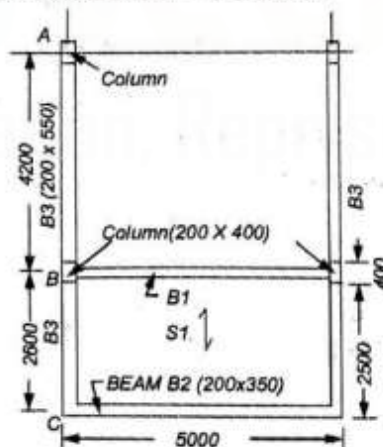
Porch Slab Simply Supported on Beams
